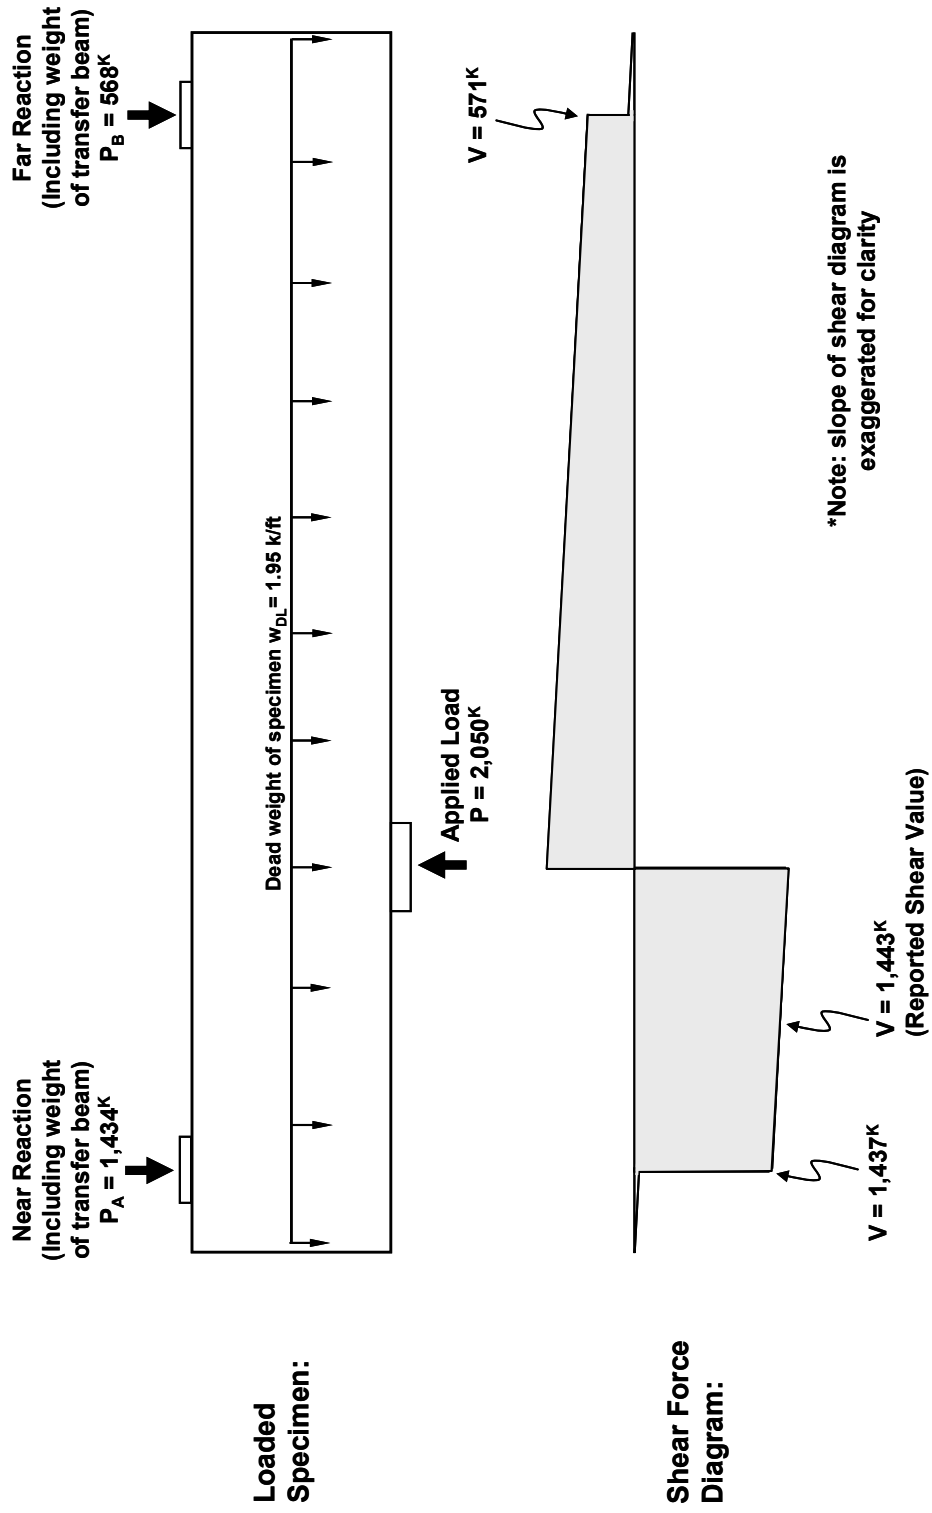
Typical specimen shear force diagram at maximum applied load
